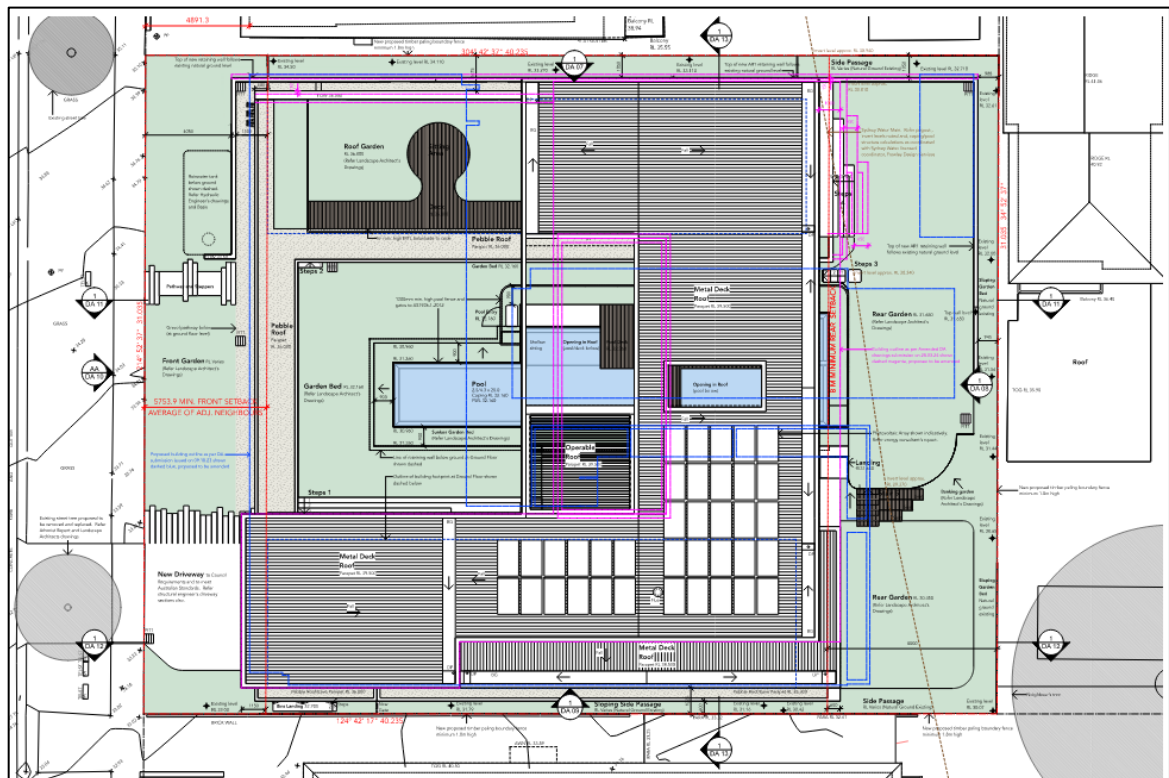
Amended Proposal - Roof Plan at Subject Site (Source: Dominic Levene)
